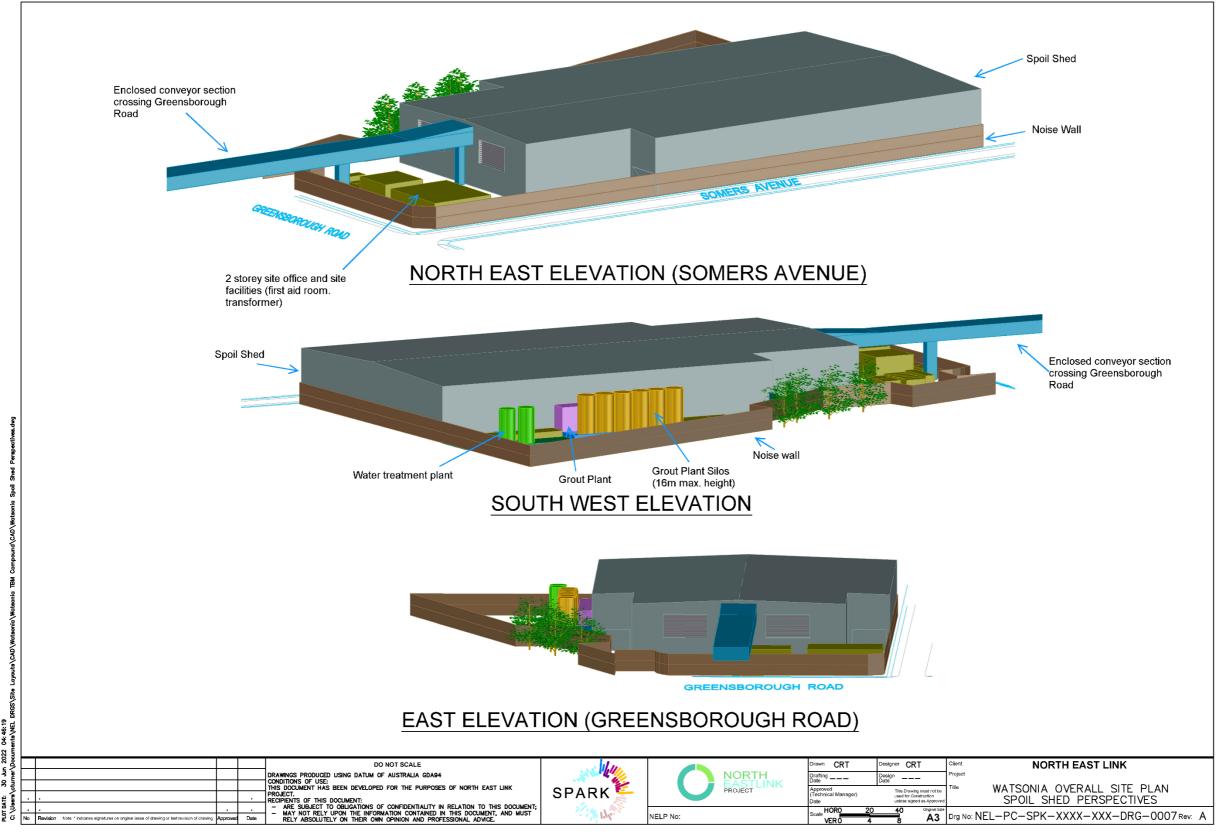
Proposed Site Perspectives for the Spoil Handling Facility at Winsor Reserve¹
